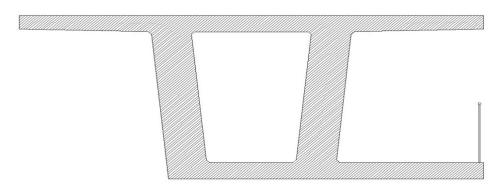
E(2) - TYPICAL CROSS SECTION OF PRESTRESSED CONCRETE BOX
